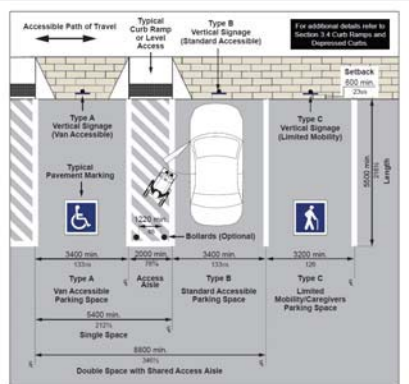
Perpendicular Accessible Parking Space Dimensions - Plan View
